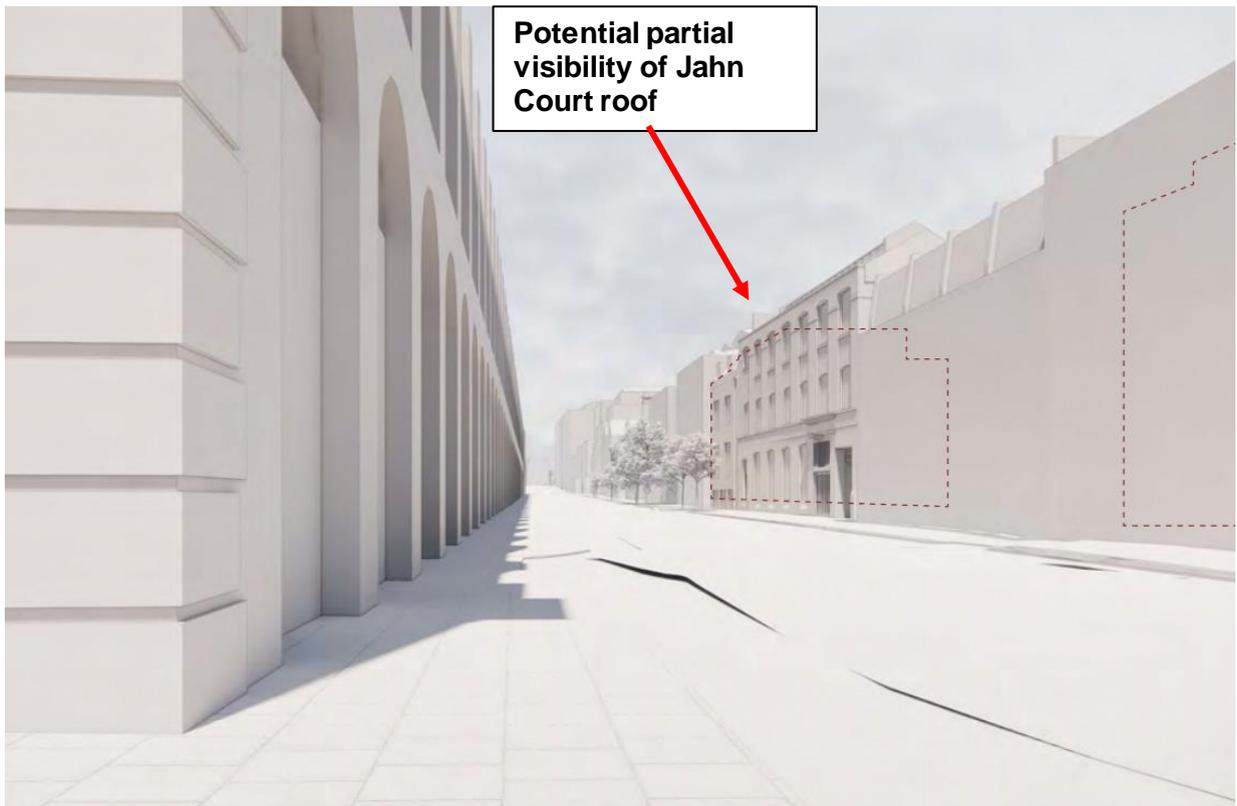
Key view 06 – View from corner of York Way and Kings Cross Station
